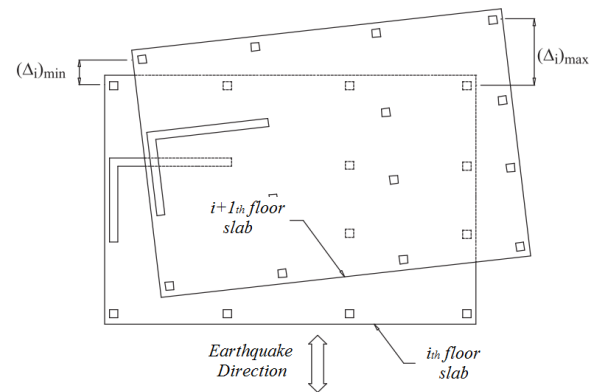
Floor plan in case of torsion (TEC 2007 – Fig. 2.1.)
